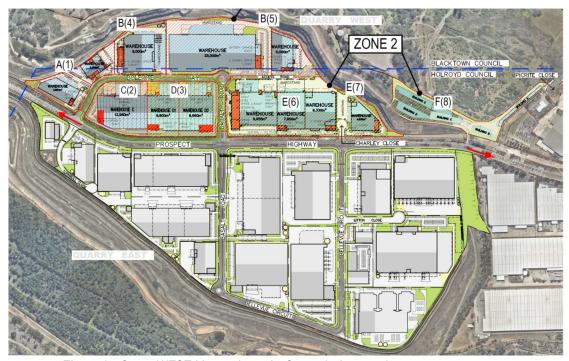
QuarryWEST Masterplan – As Currently Approved (Source: Nettleton Tribe)
